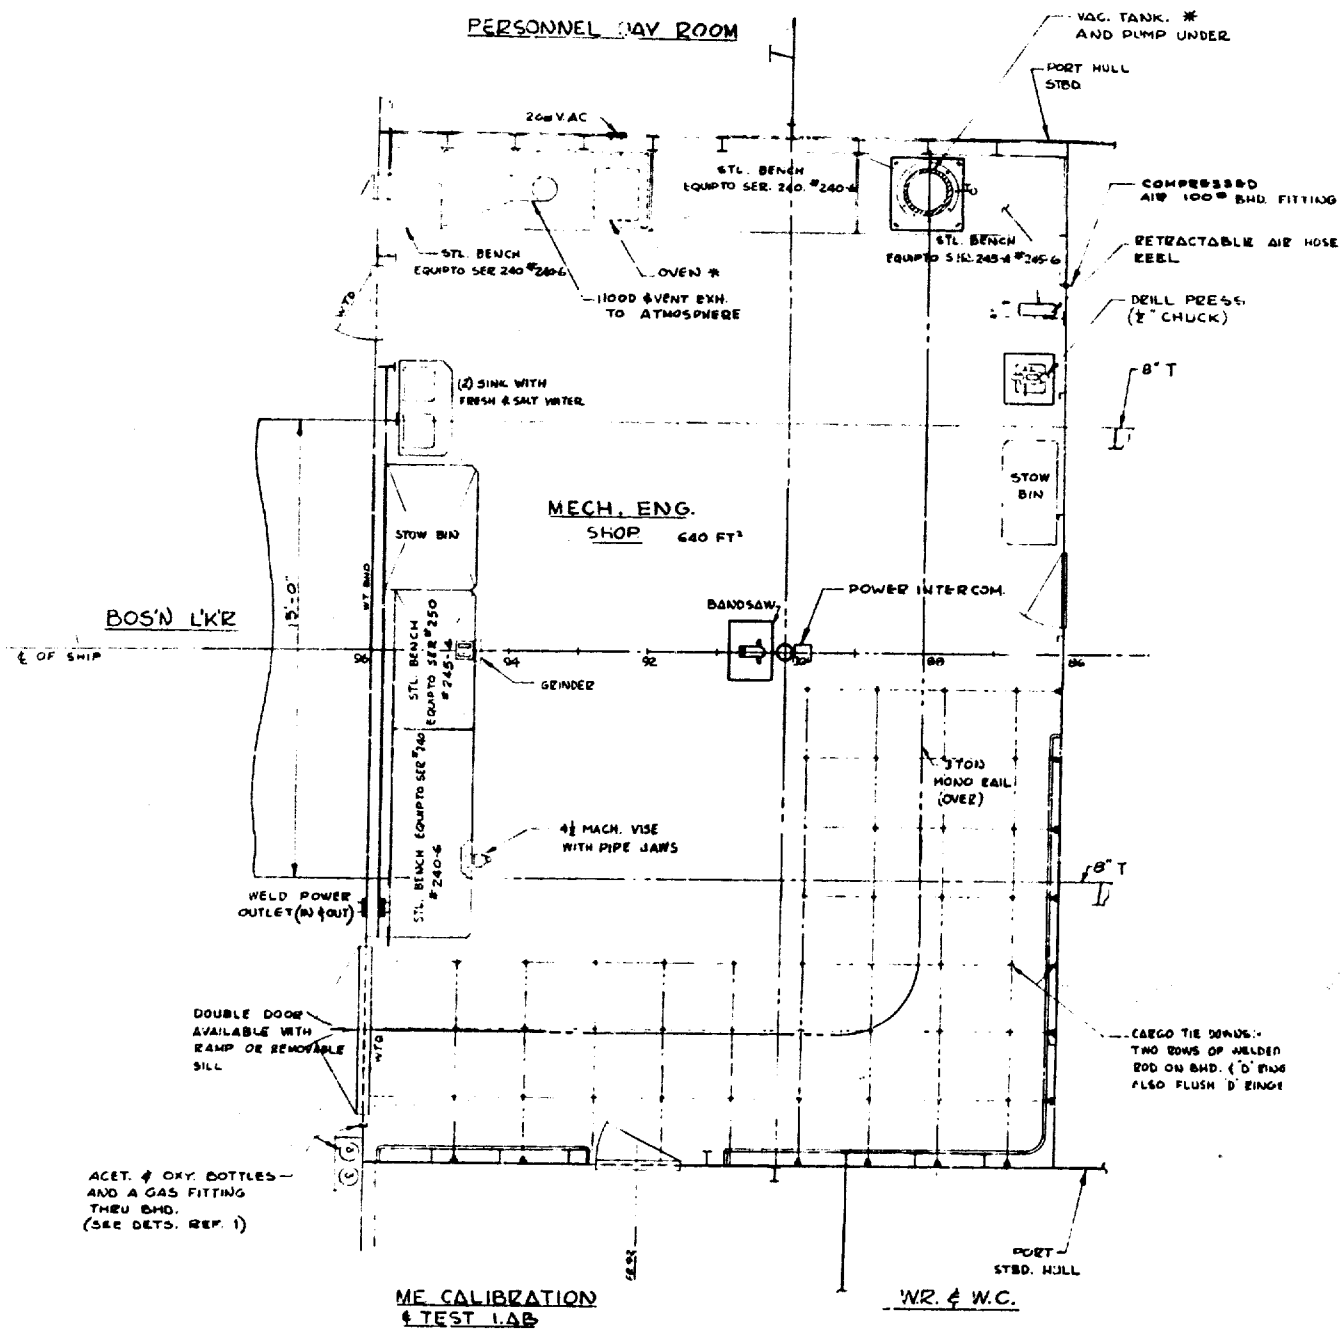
Mechanical Engineering Shop -- Main Deck
